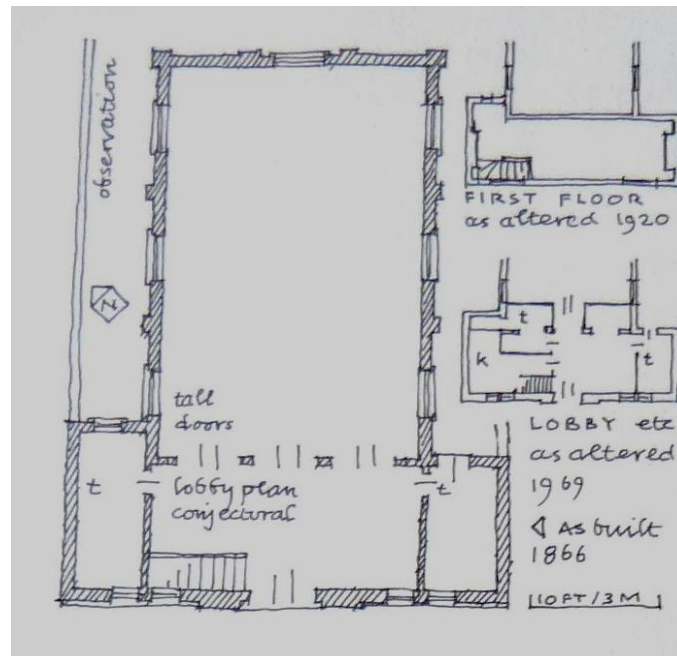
Plans of the meeting house as built and as altered (northwest is to the left; not to scale) (Butler, *The Quaker Meeting Houses of Britain*, 1999, vol. 2, p. 604)
